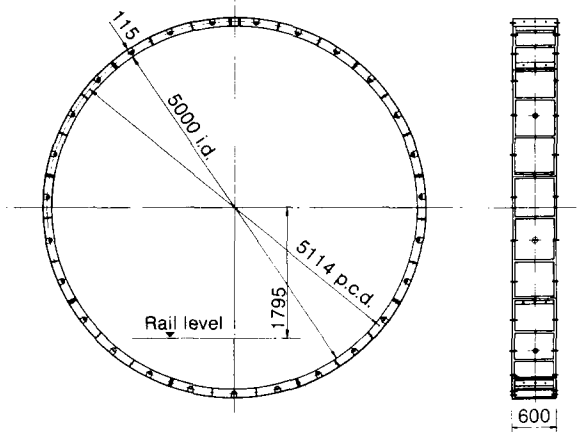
SGI segmental lining, 5.0 m i.d., width 600 mm (dimensions in millimetres)
